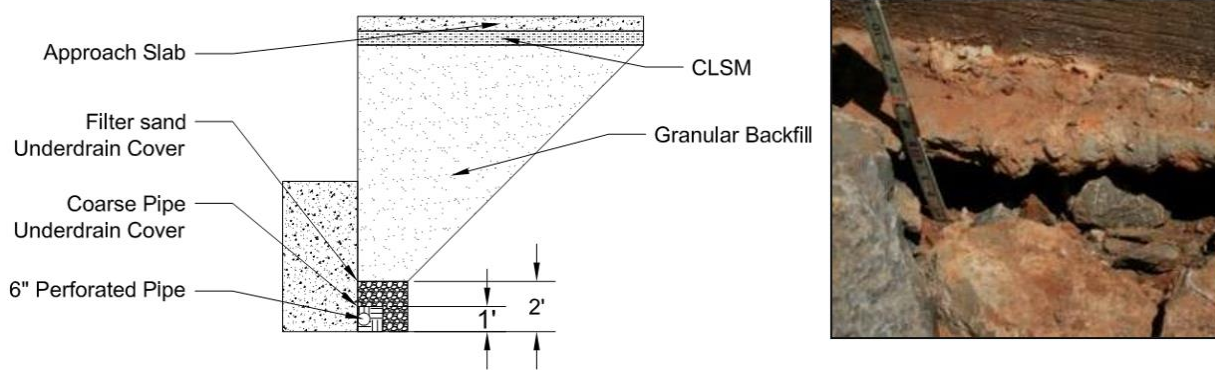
Underdrain Design, after ODOT Proposed Plan for S.H. 6 over West Elk Creek
